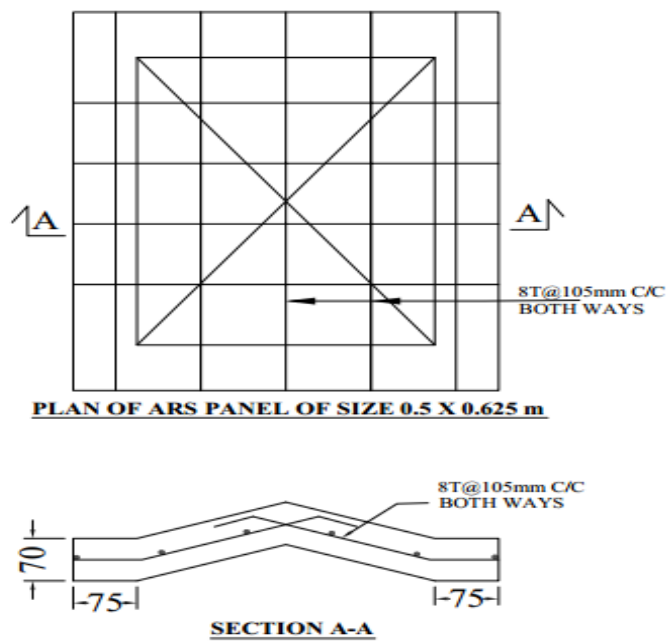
Reinforcement Layout (forPanelofSize0.5mX0.625m)
